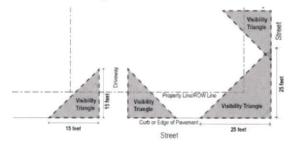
Visibility Triangles at Driveways and Intersections
